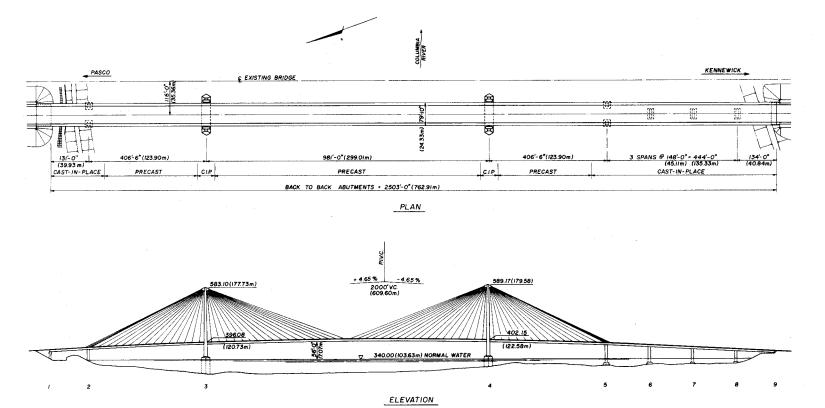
Elevation and plan drawings of the Intercity Bridge.
